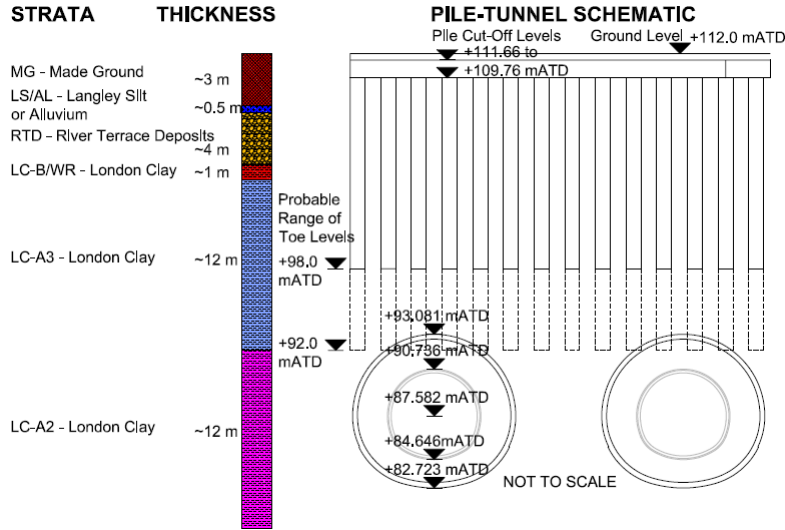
Tunnelling beneath KC piled buildings for Crossrail, London, Mair and Williamson [2014]
